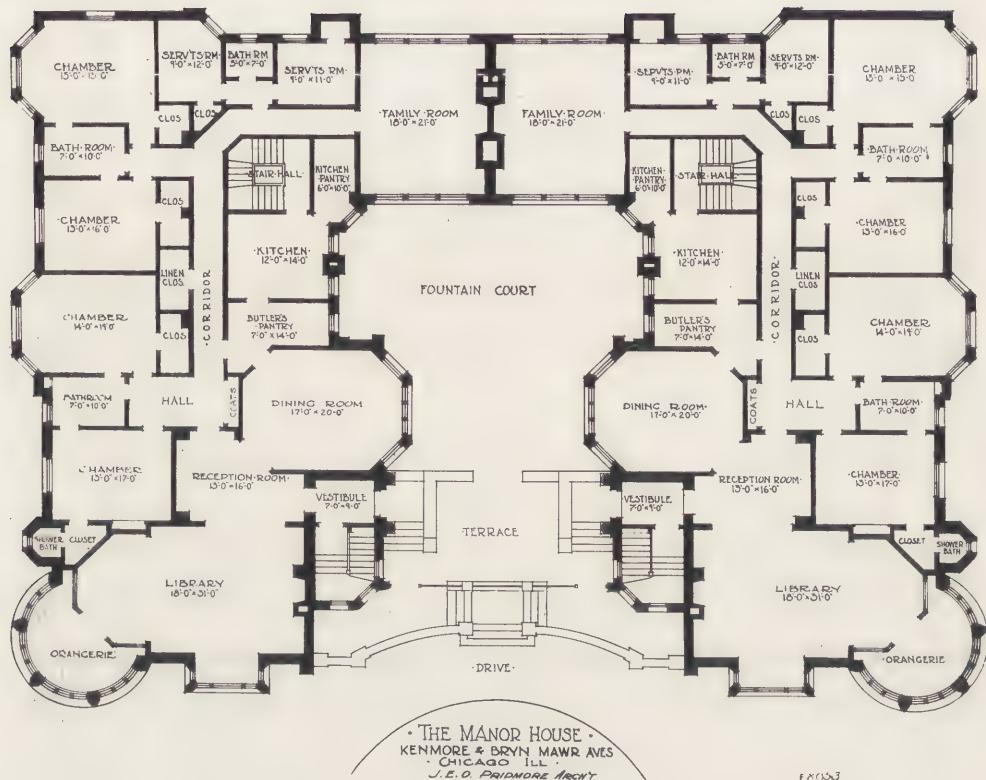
PRINCIPAL FLOOR PLAN—"THE MANOR HOUSE," CHICAGO, ILL.
